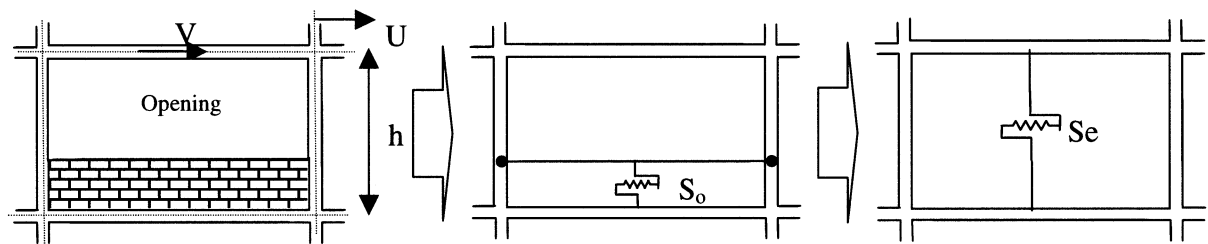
c. Infill masonry walls with one up-full-opening Type D.
